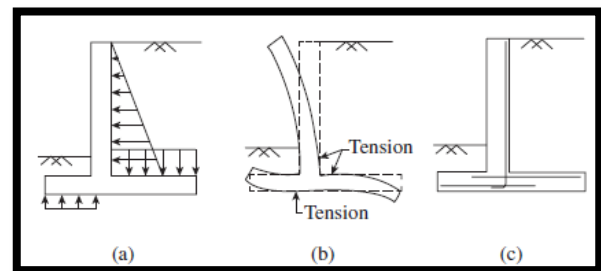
Behaviour of Cantilever Retaining Wall: (a) Loads on stem, toe and heel slabs (b) deflected shape (c) Location of main reinforcement, [5]
